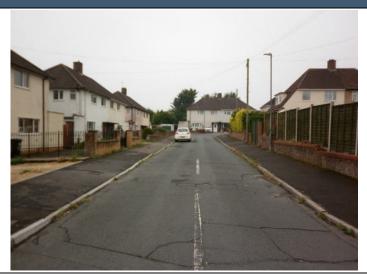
Canon's Walk (Facing south west by 113 Pound Road)
